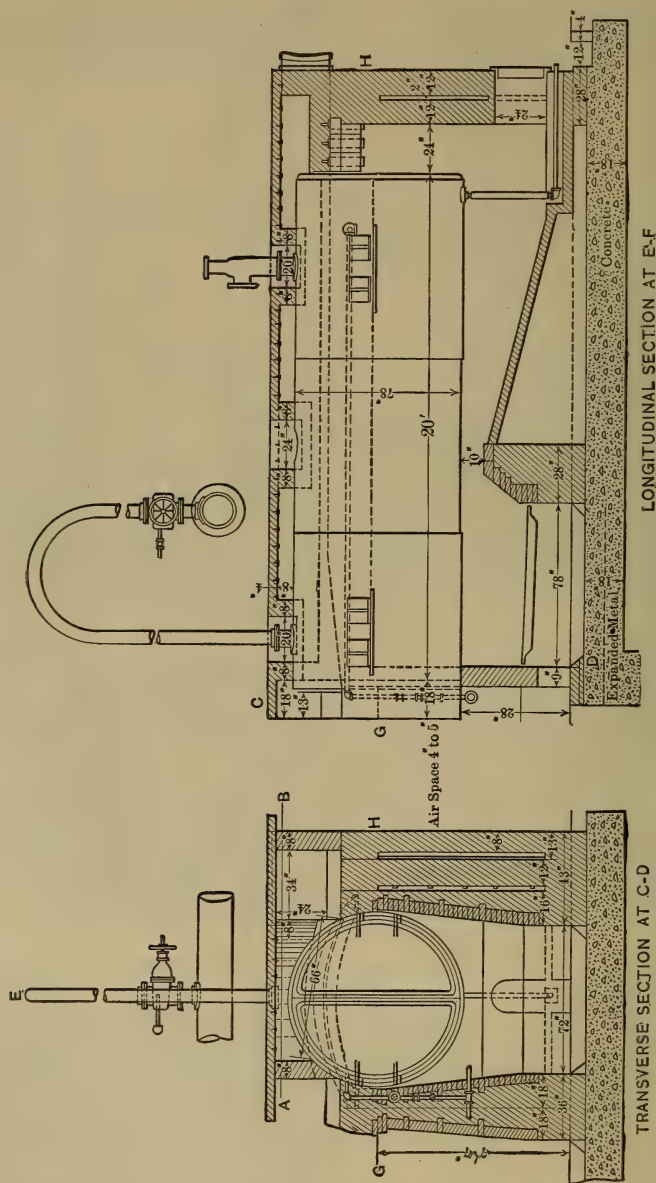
Return Tubular Boiler Setting — Steel Beam Suspension.
